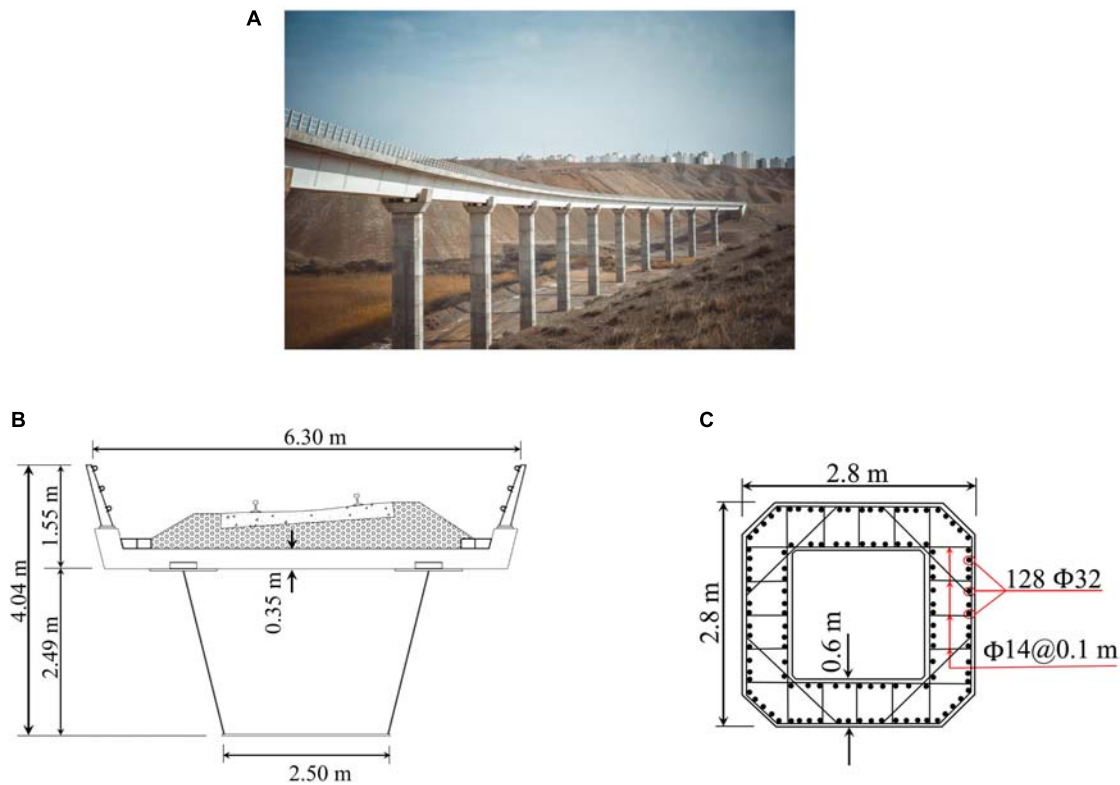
| (A) The isolated Rudshur bridge; (B) typical cross-section of the deck; (C) typical reinforcement of the piers at the critical section.
